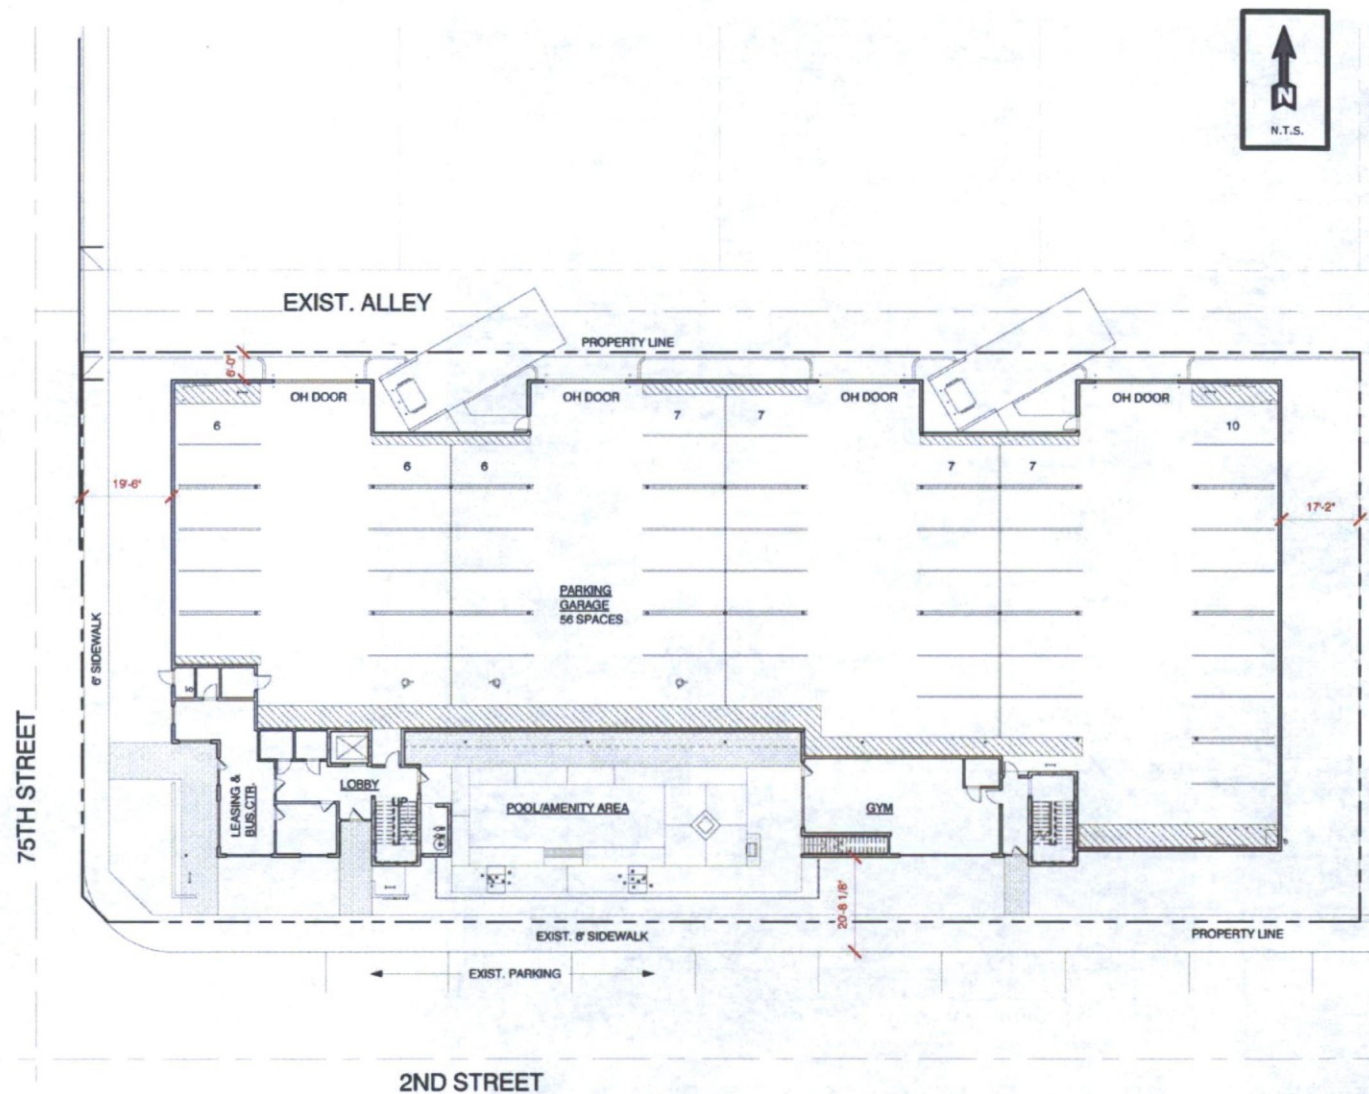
provides the proposed site plan. The building will contain four stories of development. The ground floor will consist of parking, a lobby and amenities with the 39 dwelling units contained on the above three floors. All vehicular access will be provided by the existing alley along the northern edge of the site which currently connects to 75<sup>th</sup> Street on the west and Miller Road on the east. A total of four (4) separate driveways will be provided to the existing alley.
